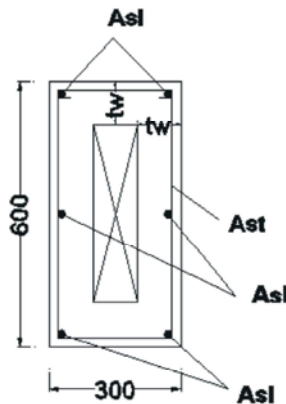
Details of a steel reinforced beam for group I, where the main variable was the box section wall thickness
